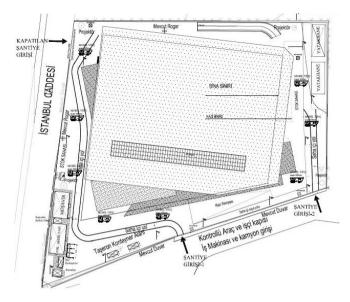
Selçuklu Congress Center Construction Site Mobilization Plan
